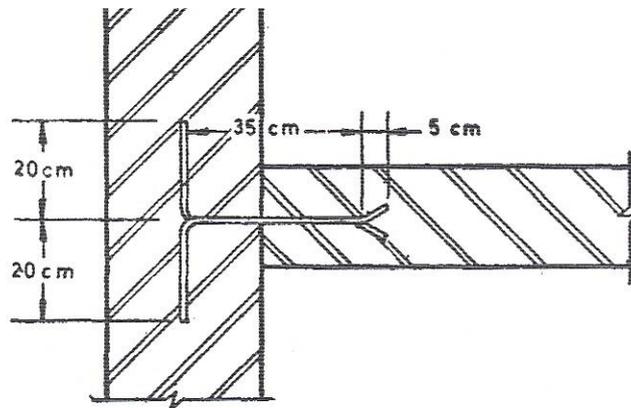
Anchoring of Stiffening Wall With Supported Wall
